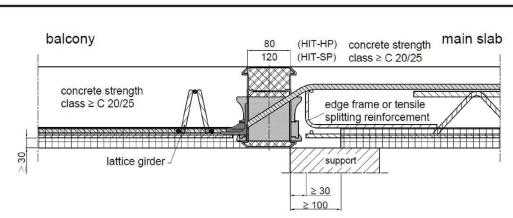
Example of the connection HIT-HP/SP ZVX to element slabs with statically effective in-situ layer
